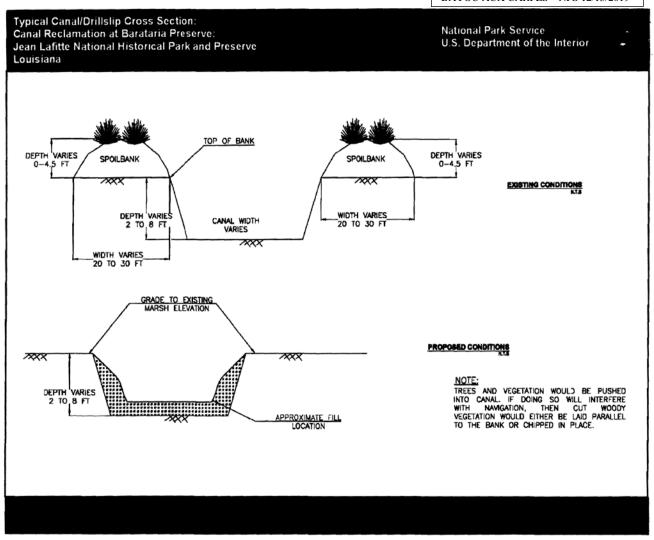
Typical canal/spoil bank cross-section with existing canal and spoil bank conditions and proposed canal conditions with spoil bank removal and canal backfilling.
